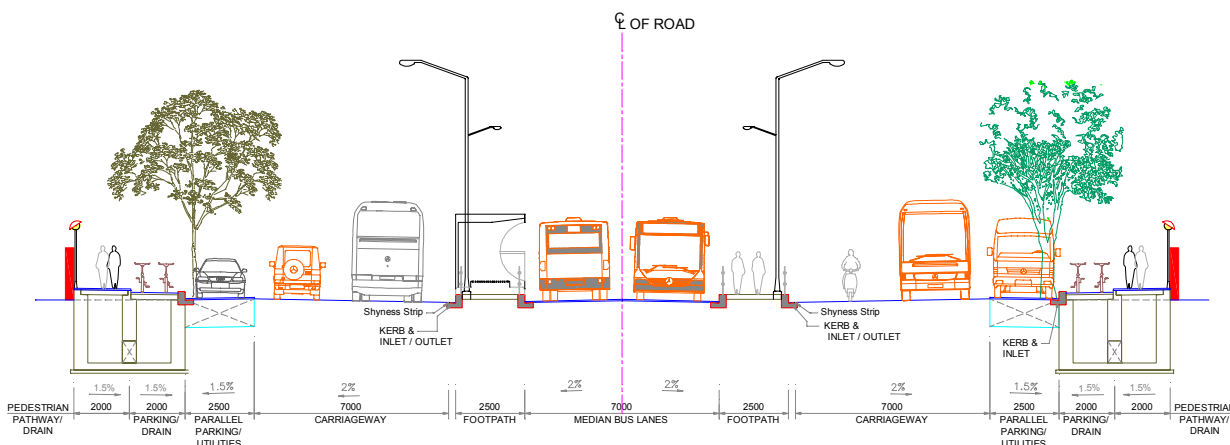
CS: B-B: BRT system Cross-section at Bus Station (total 40 m)
